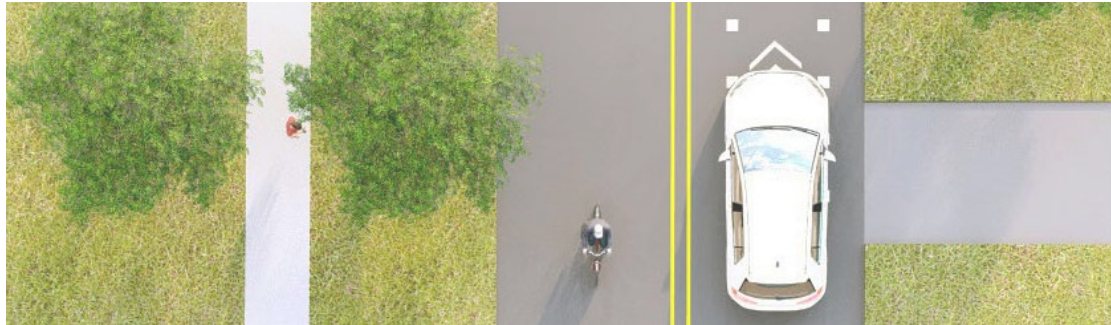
Watauga Street from Broad Street to East Center StreetConstruction Cost: \$61,680.00
